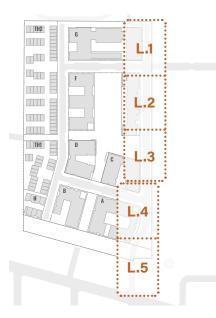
Lee Avenue, Section 2 *see "Figure 5.13–4 & 5: Lee Avenue, Plan Enlargements L.2 & L.3
